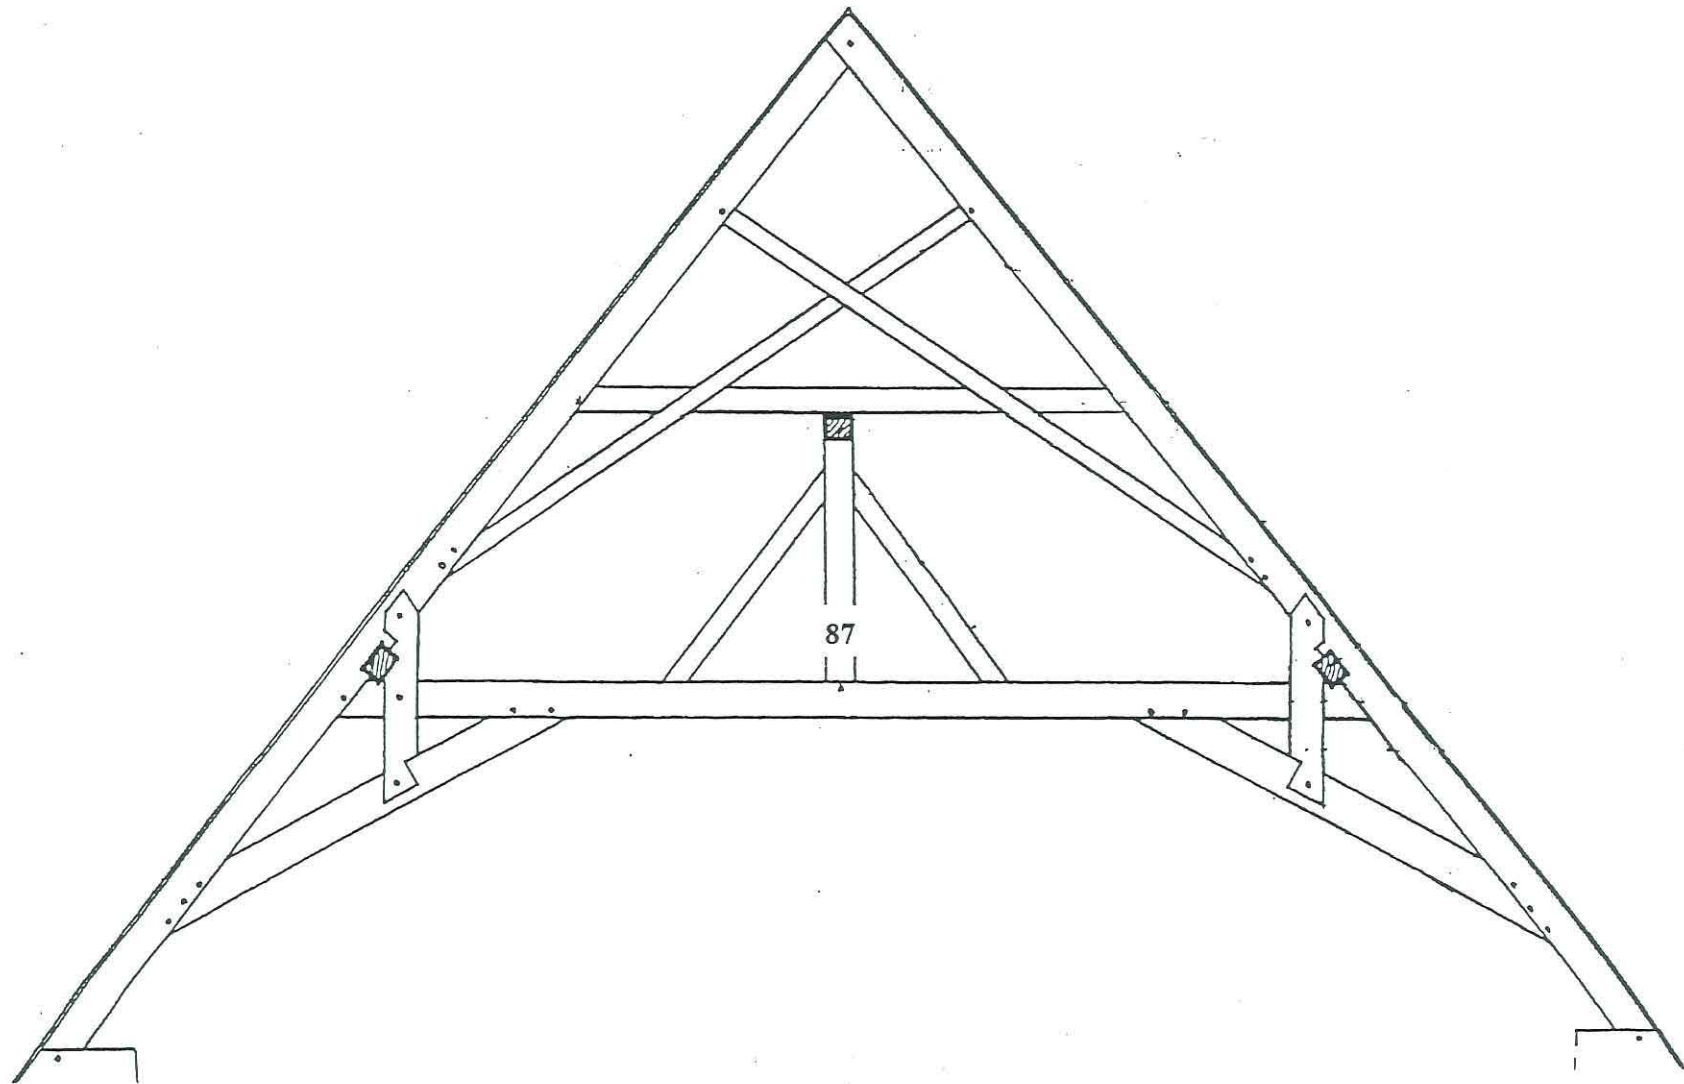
Drawing of frame 63 of the Choir and crossing, viewed from the east, to show sample locations
